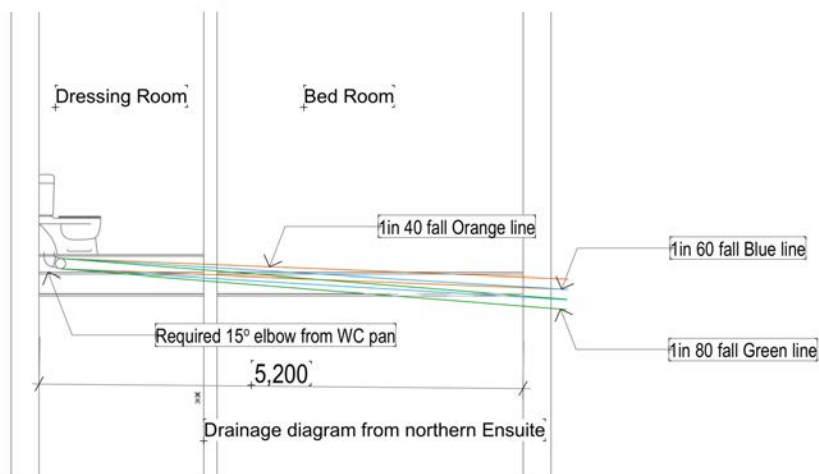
Drainage limitations on positioning Guestroom 1 Ensuite on the north wall Source: carste STUDIO
